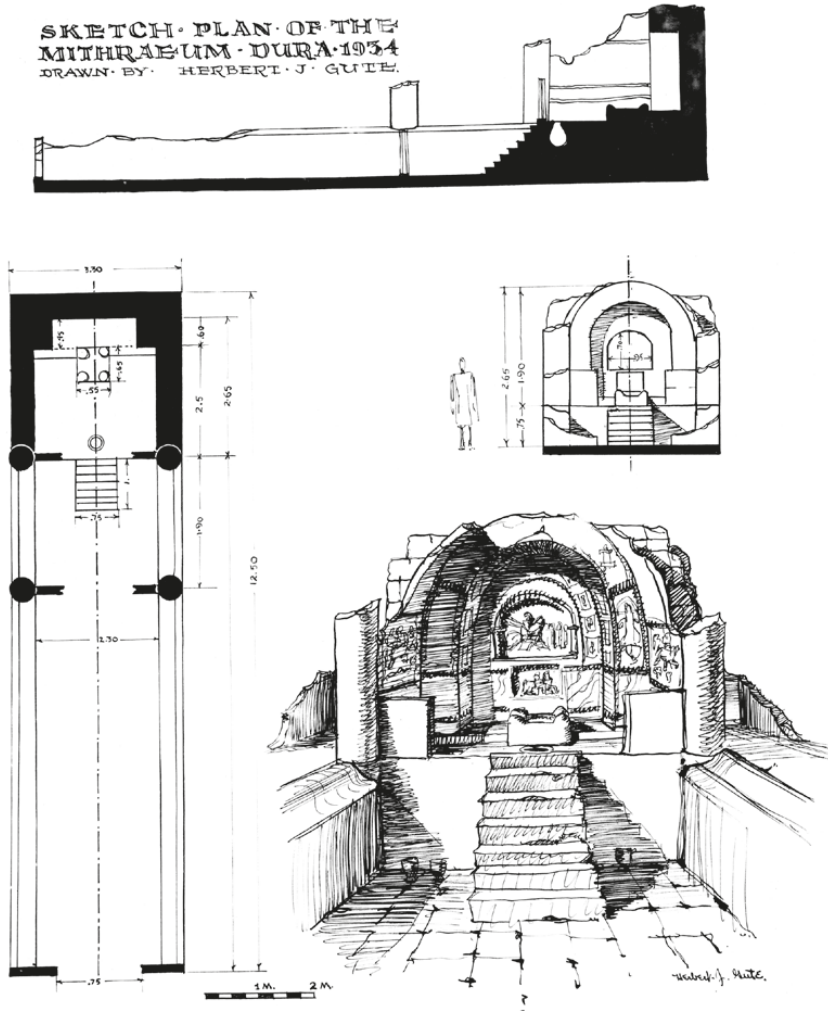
PLATE LVIII Sketch plan of the mithraeum by Herbert Gute, 1934.
